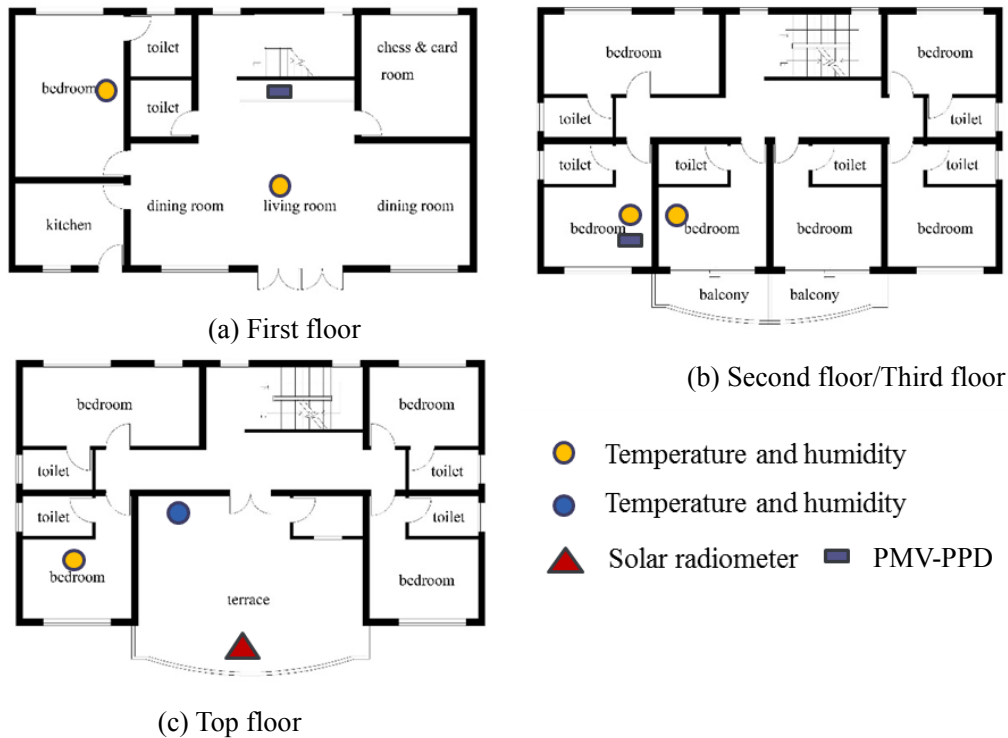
Building plan and measuring point distribution(MB-1)
